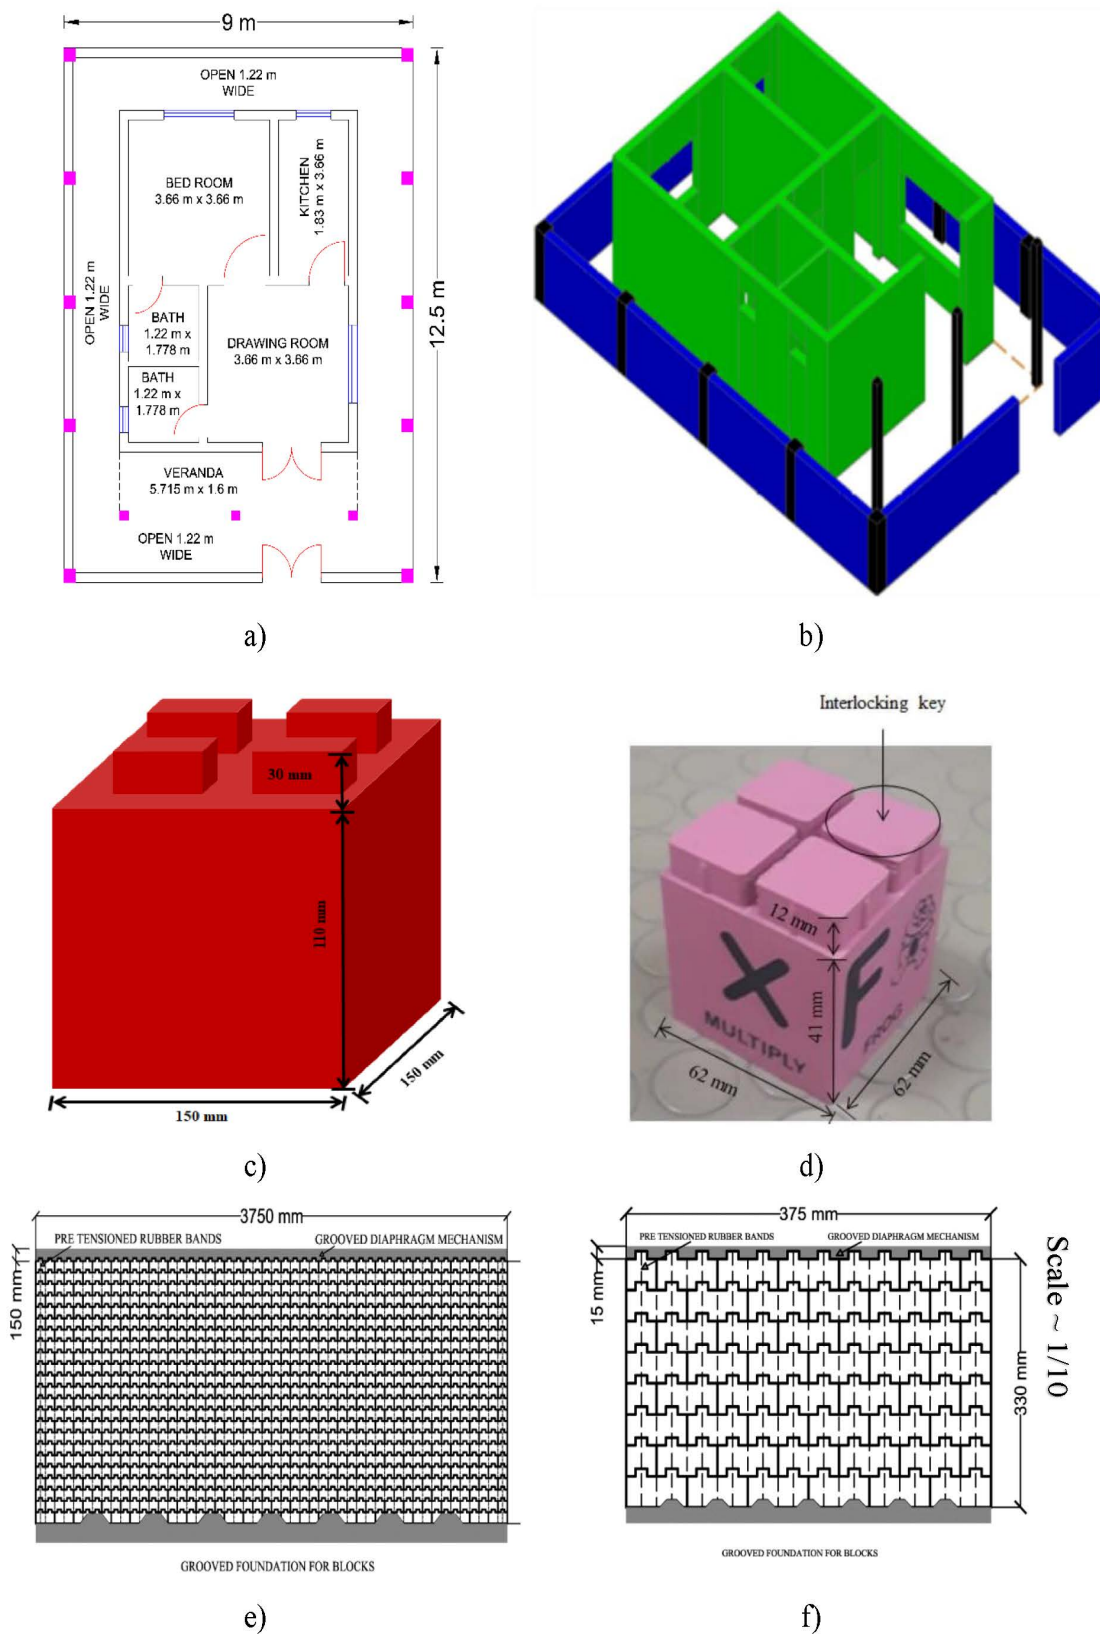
Proposed inter-locking plastic-block house: a) plan, b) 3D view c) proposed for construction and d) prototype for current study e) scaled down proposed real wall f) scaled down prototype wall.
